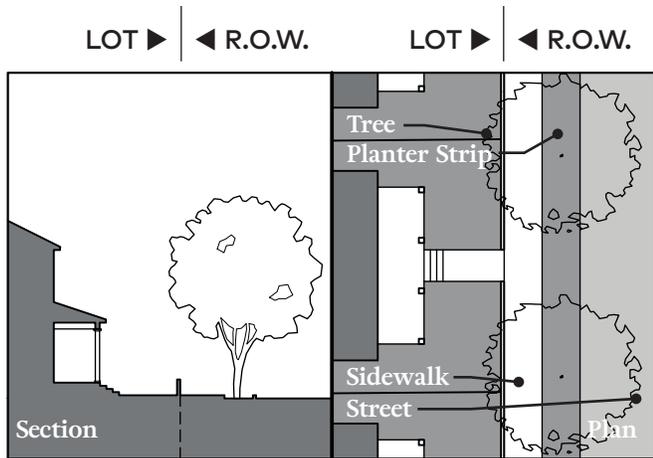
e Sidewalk-Planting Strip Public Frontage
